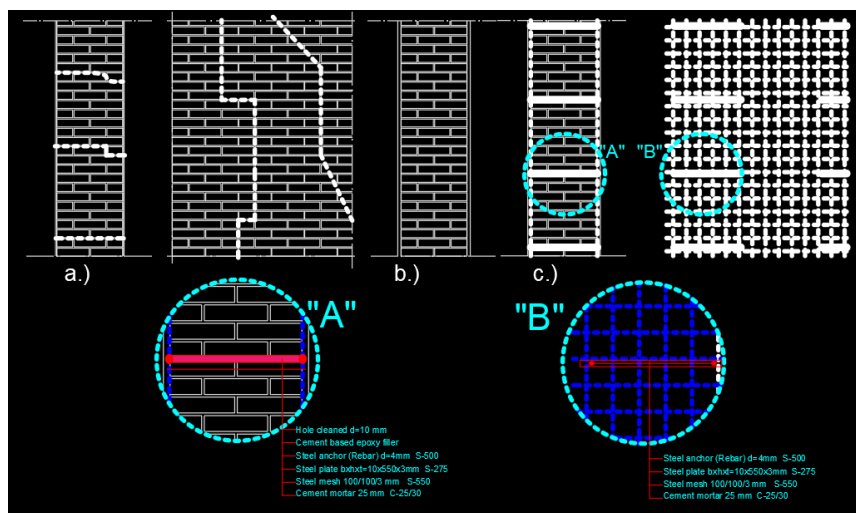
a) Cracked wall after the earthquake; b) Repaired wall; c) Proposed reinforced wall.
